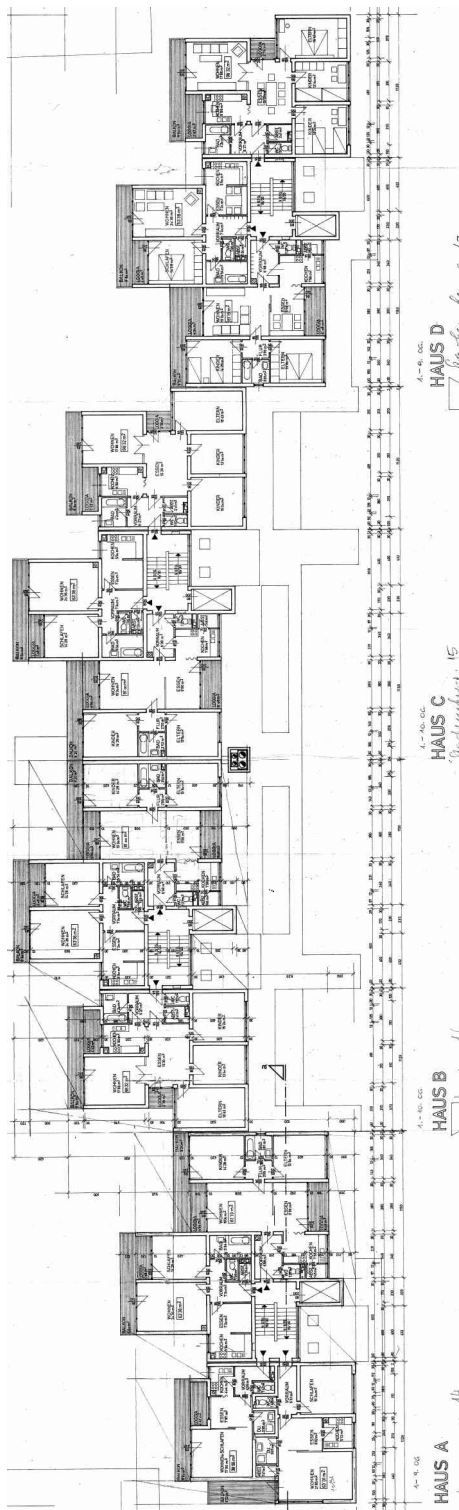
Plans and photos of Austrian demonstration project.
